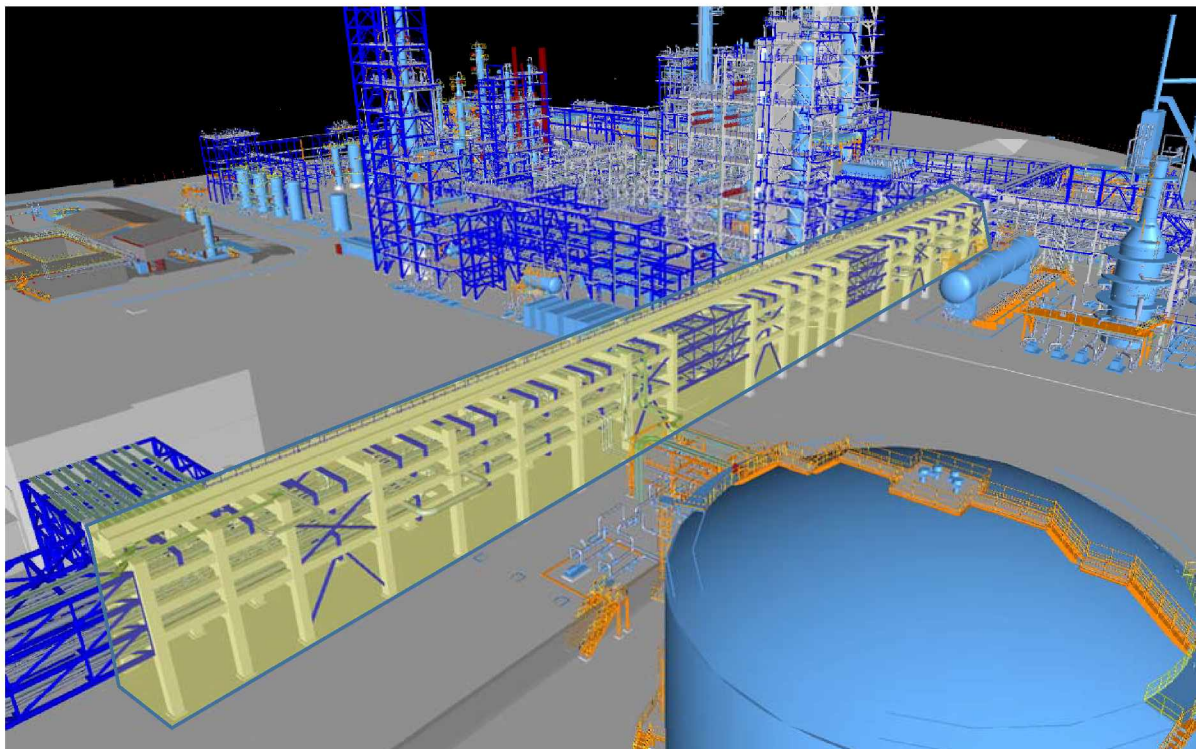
Interconnecting Precast Pipe Rack 081-PR-100
